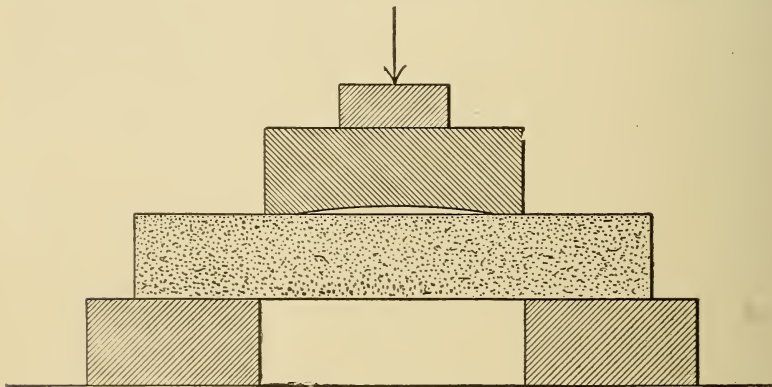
Illustrating the Method for Conducting Shearing Tests.
